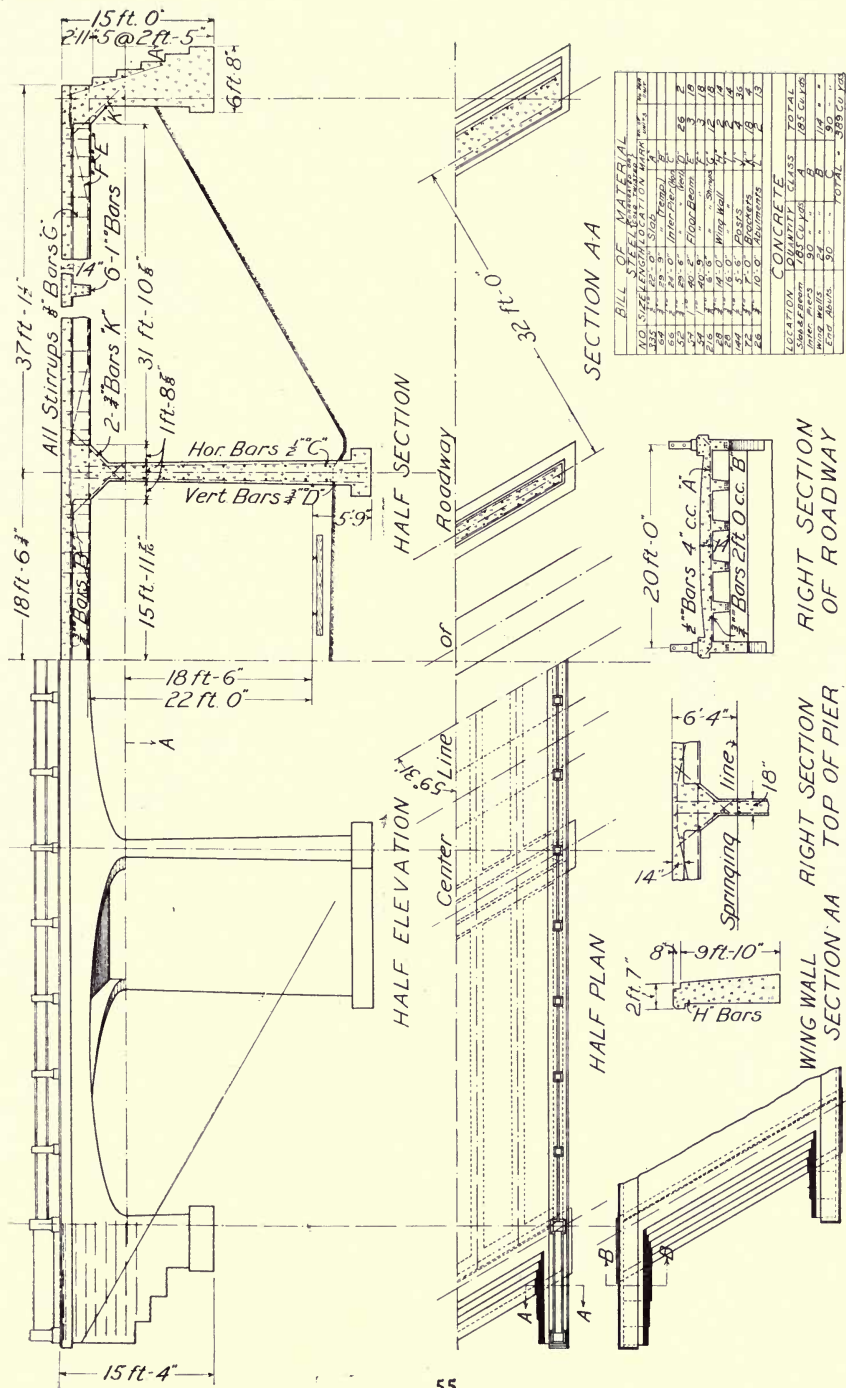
HALF ELEVATION, HALF SECTION, OVERHEAD HIGHWAY BRIDGE, NO. 1931, D. L. & W. R. R.
